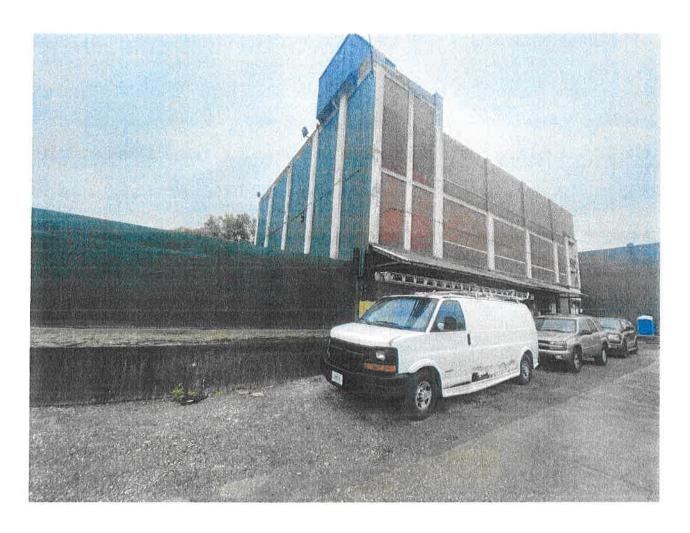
Existing Brick non-bearing brick wall along south and east elevations
